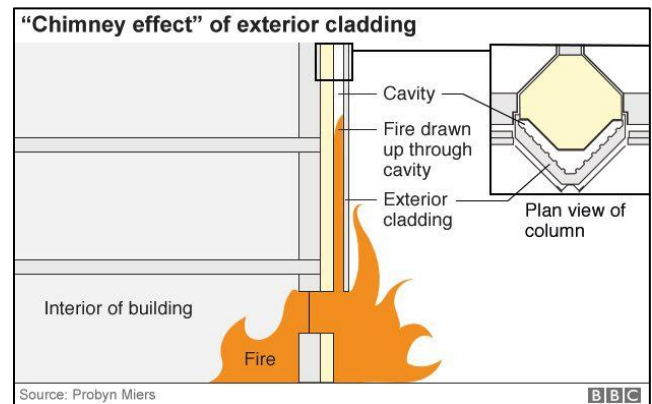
Exterior cladding of Grenfell Tower (Source: BBC)
